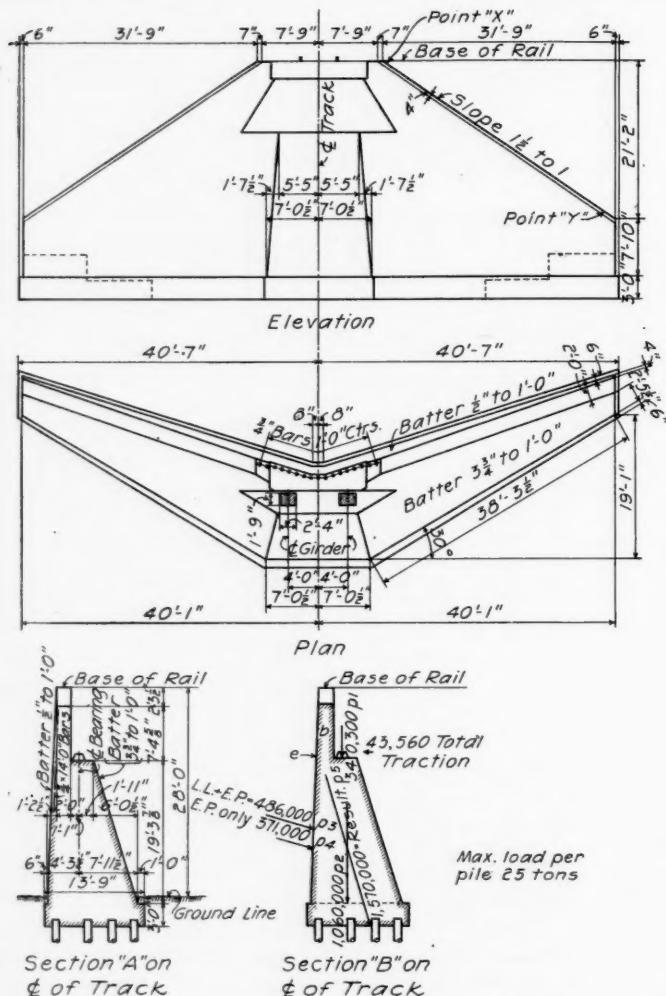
Type B₂; Plain Concrete Wing Abutment with Reinforced Backwall.
